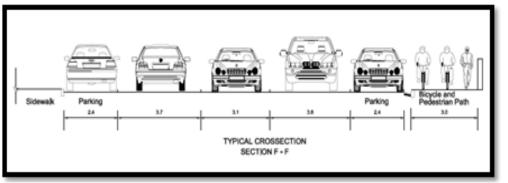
Cross-section with on-street parking for Ethekwini project
